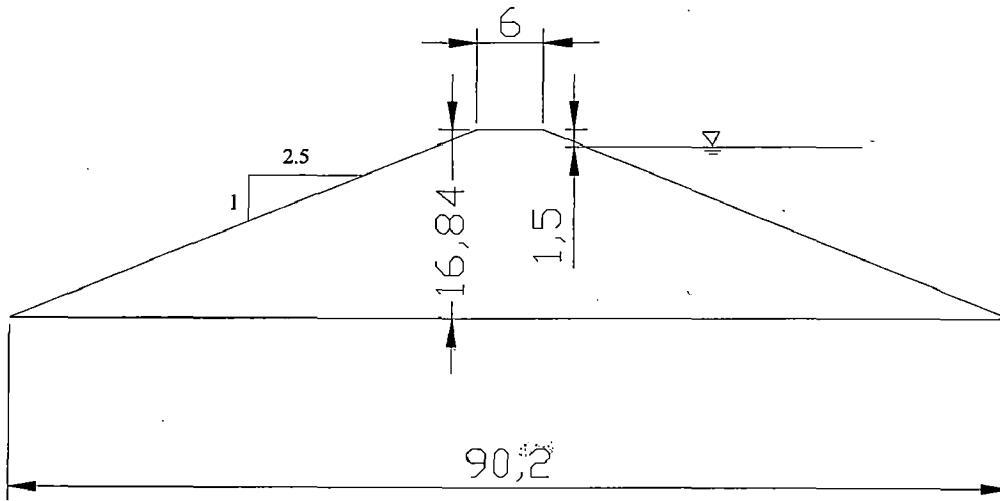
Section of the earth portion of the structure barrage-dam and earth combination
